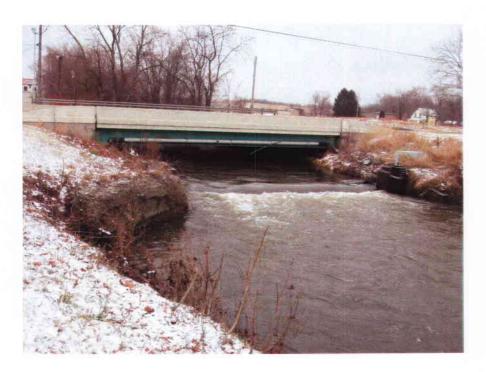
Downstream Side of Seiberling Street Bridge (looking east)
